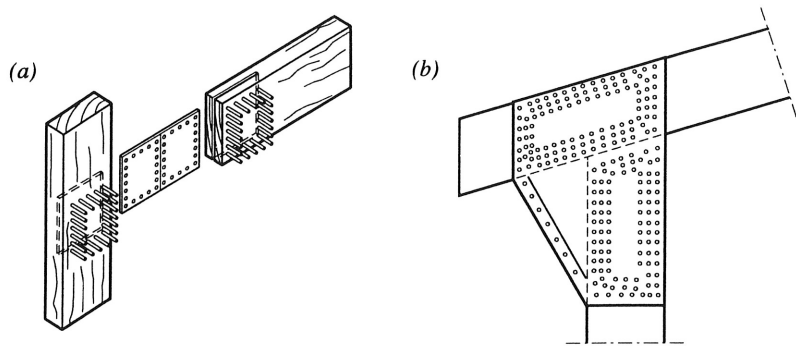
Frames with mechanically jointed in-plane members: (a) joint with internal steel plate, (b) nailed plywood gusset
